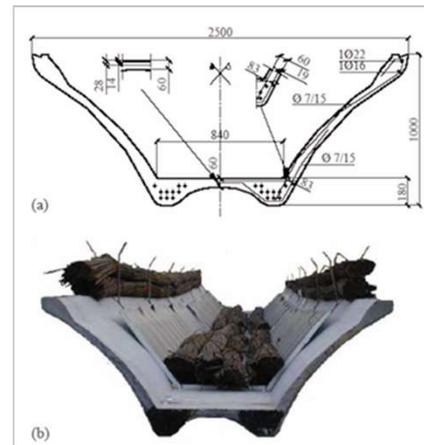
FRC precast prestressed roof elements^[1-11, 1-12, 1-13].
